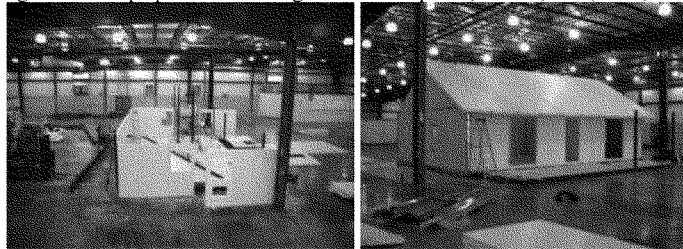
FRP composite house being erected at BRP Inc. manufacturing facility (WVU, 2008)
